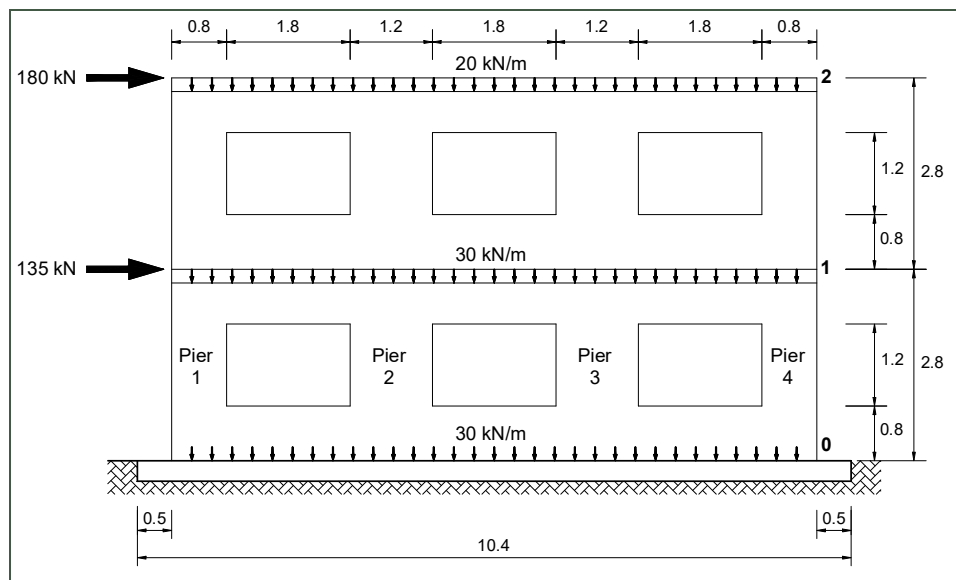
Limited Ductile 2-Storey Masonry Wall with Openings.
